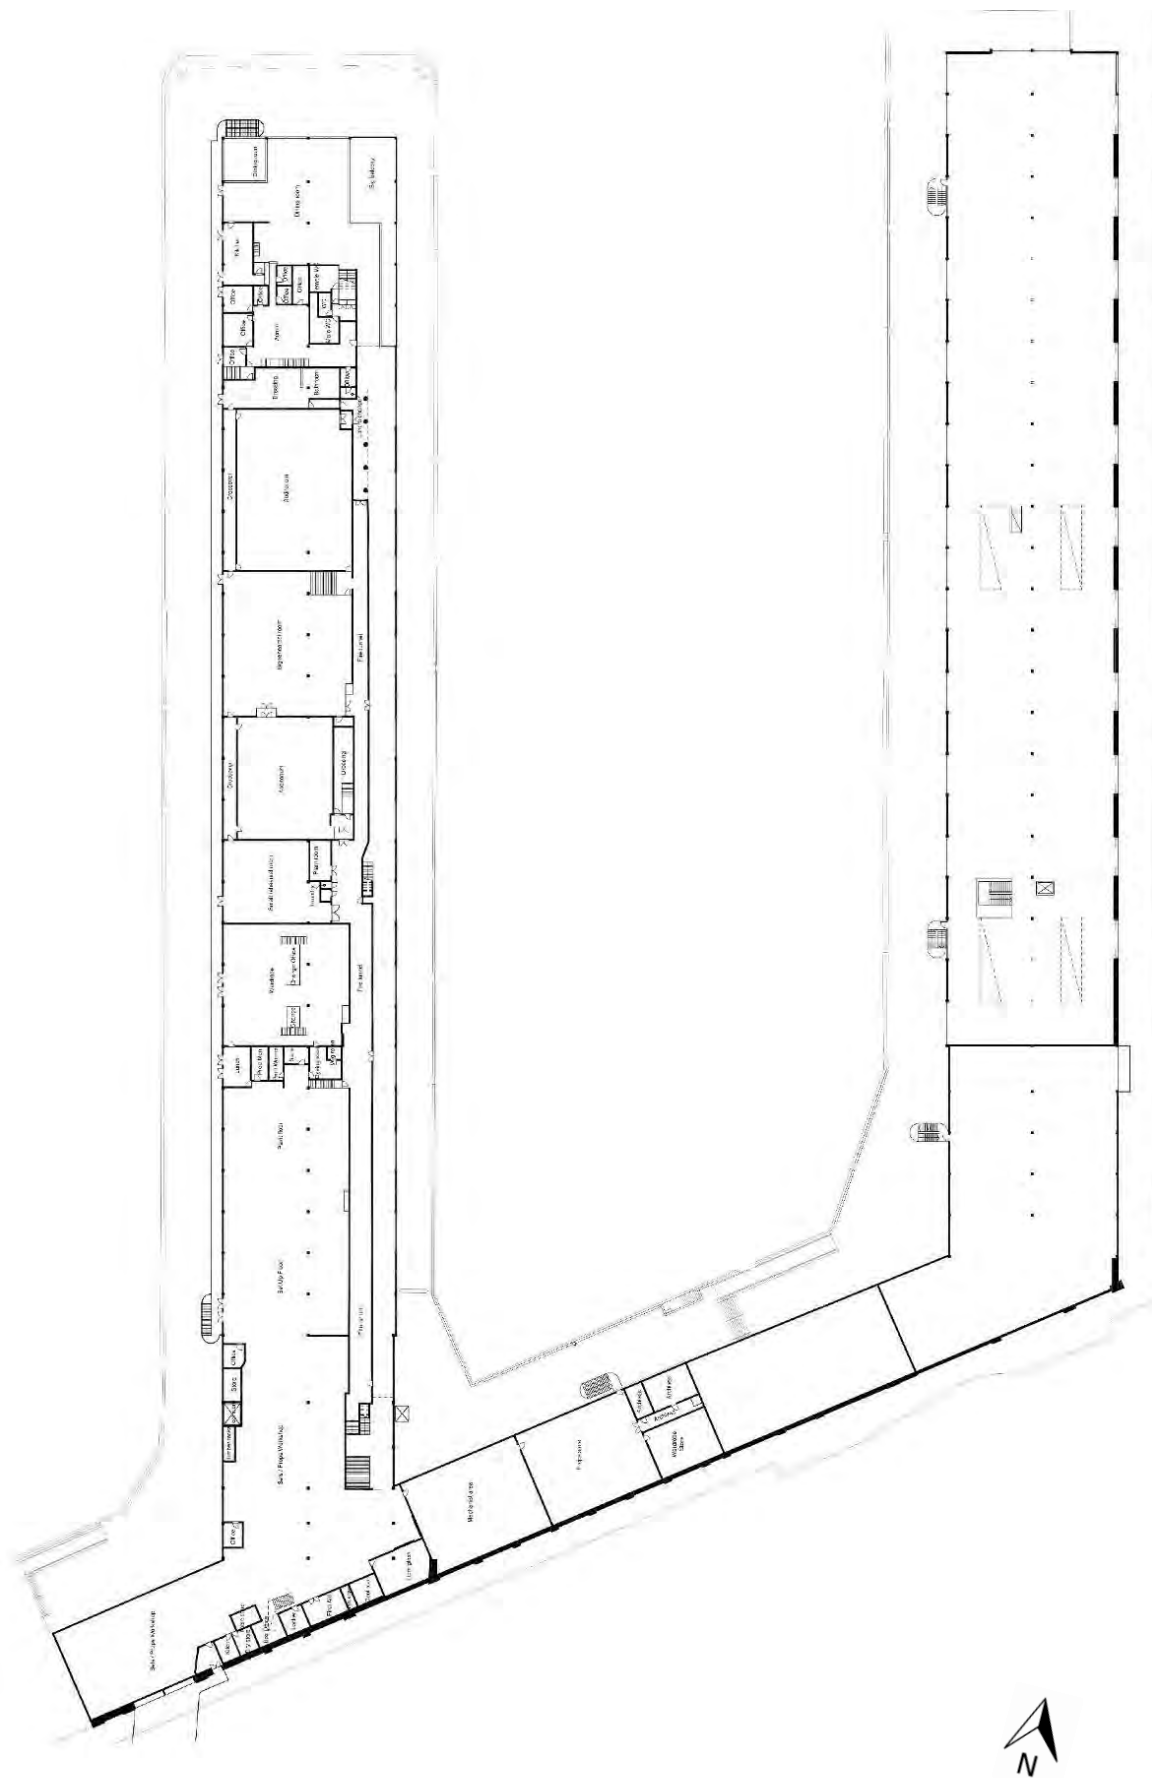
Existing First Floor Plan. Resource from TZG Architects.
